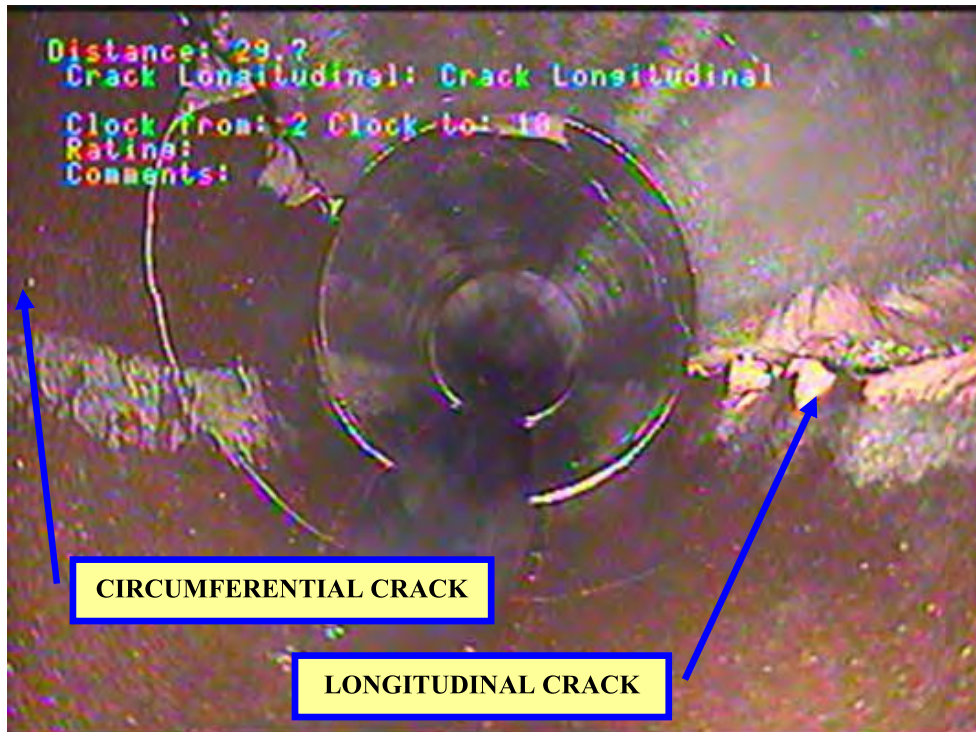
Longitudinal and circumferential cracks in sewer main
